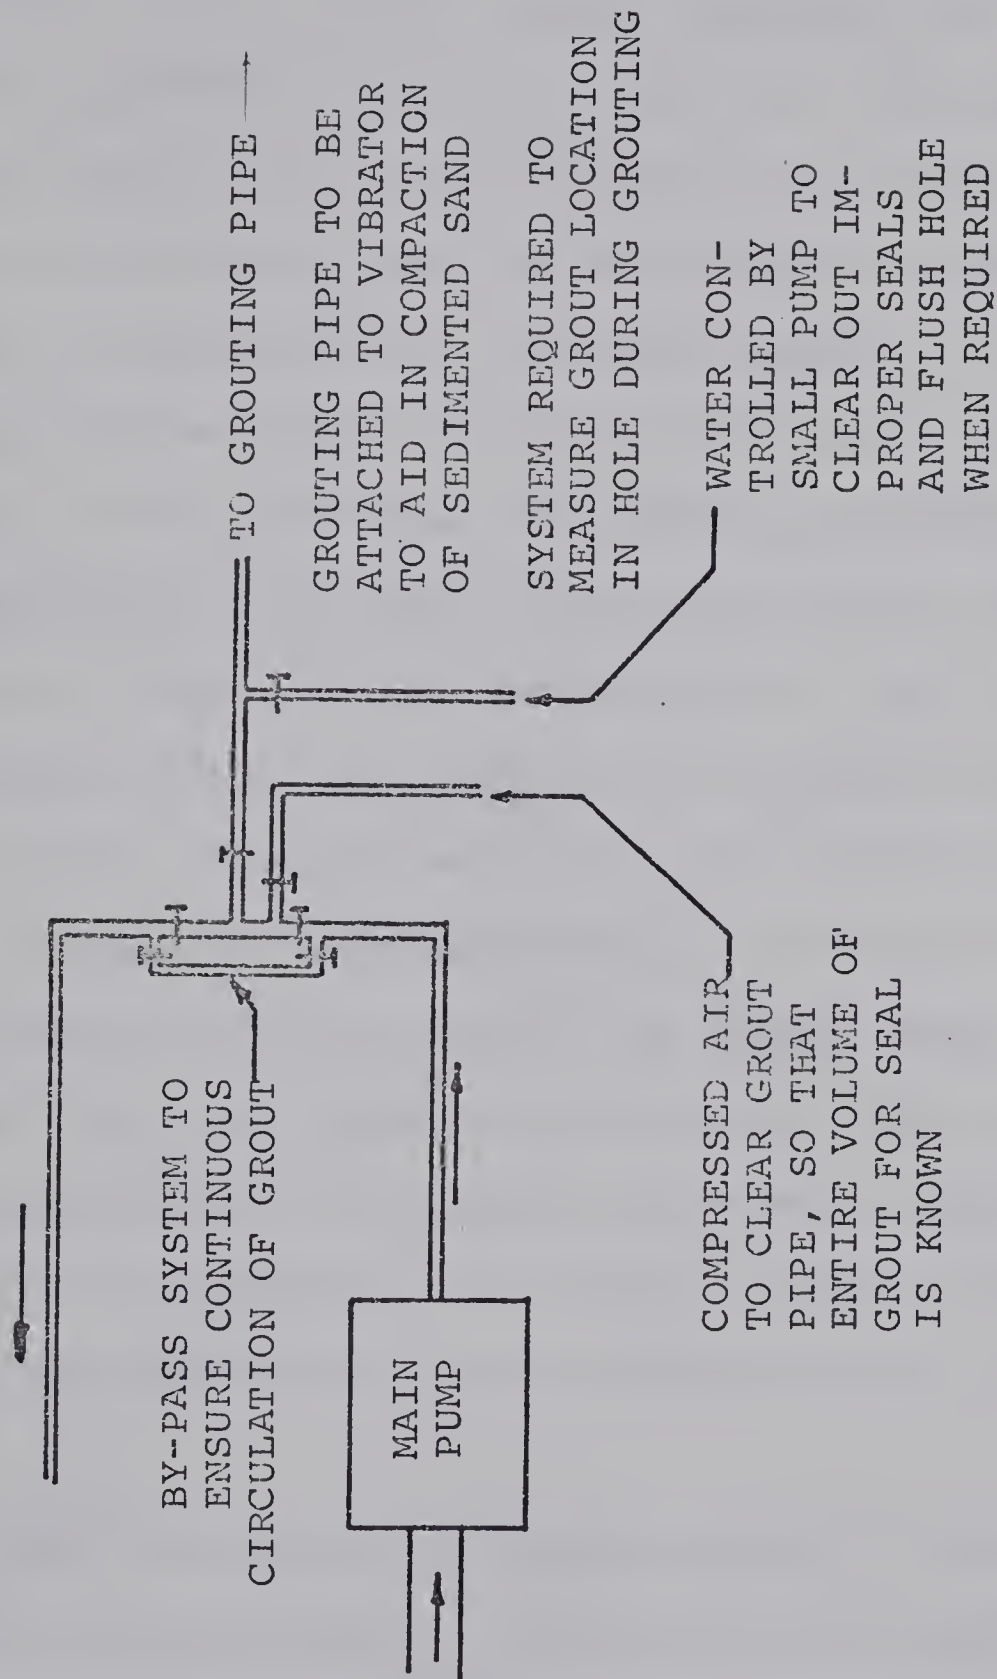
PROPOSED MODIFIED GROUTING SYSTEM
